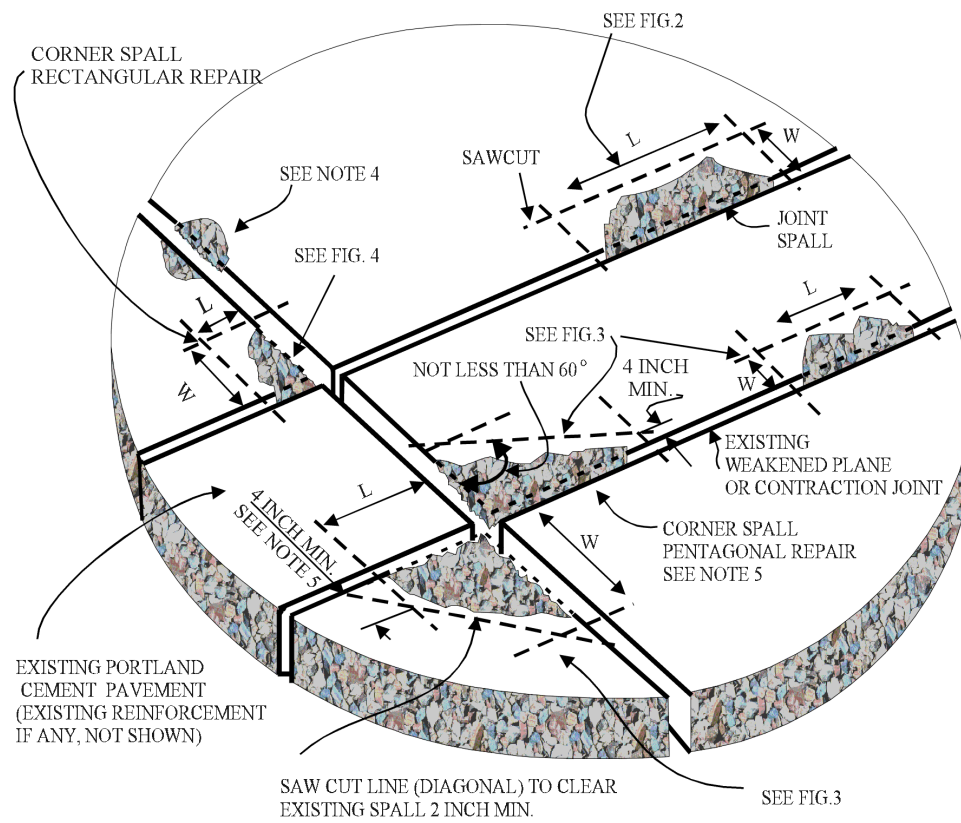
Plan of spall repairs (notes for figures begin on page 12; notes 1-5 apply to this figure)
